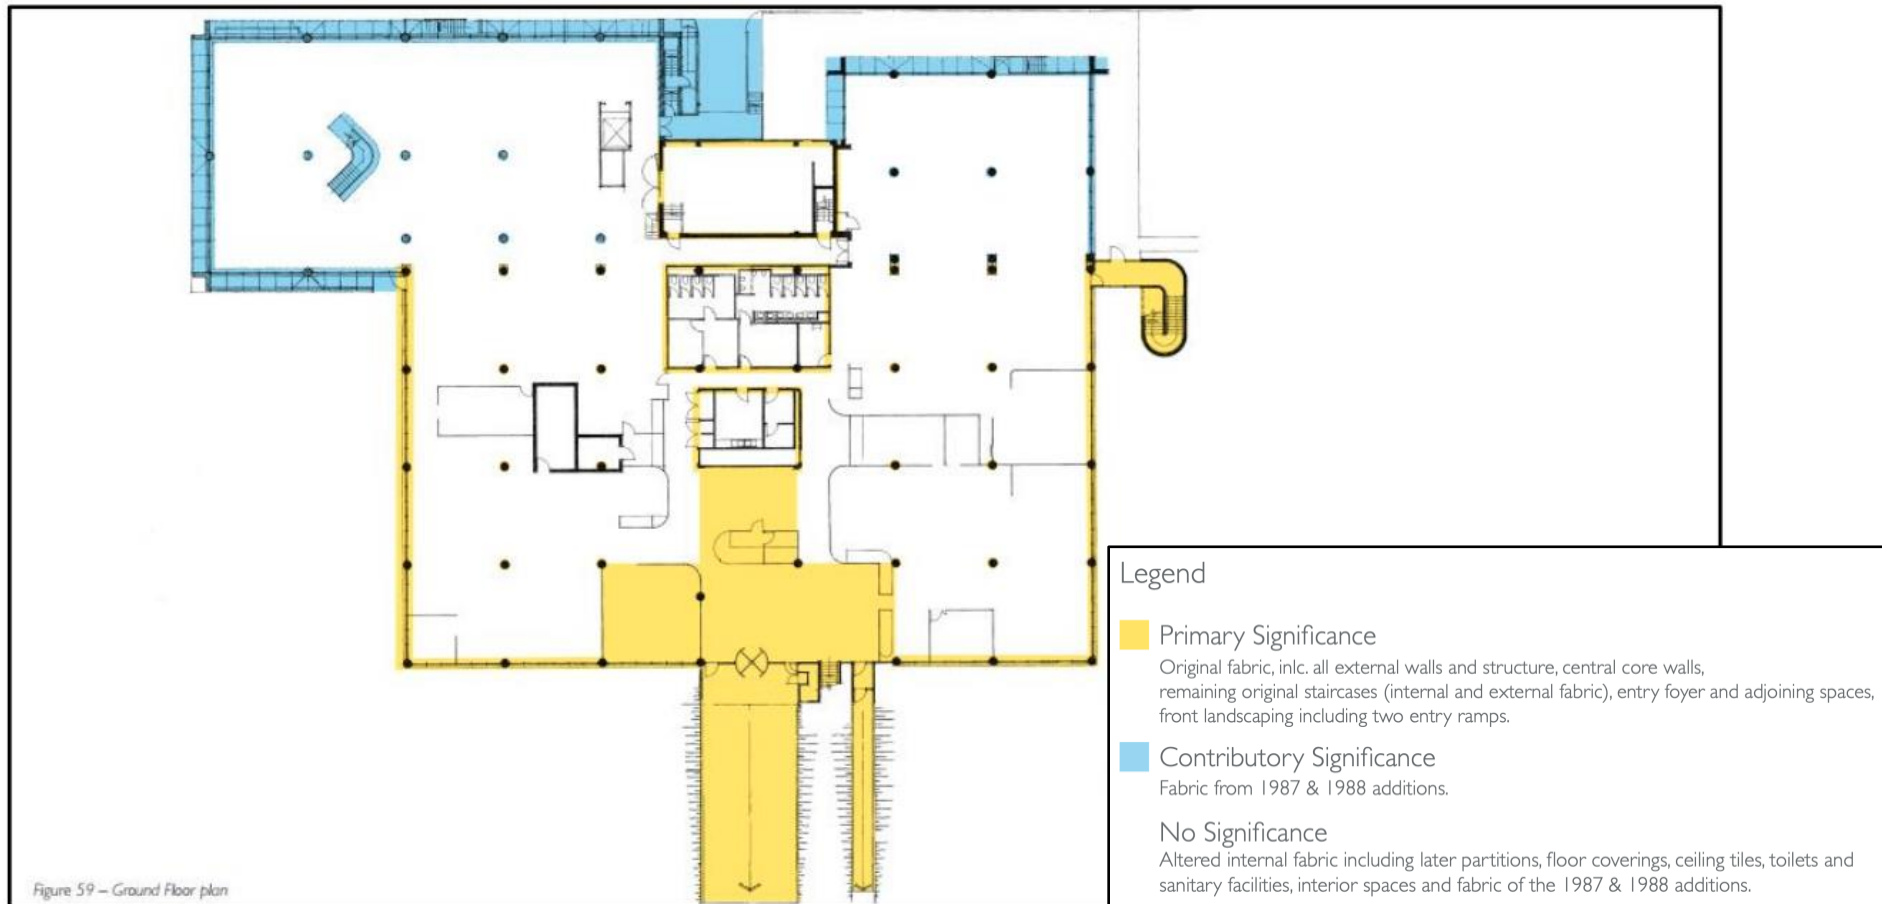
Levels of Significance Drawings – Ground Floor Plan
